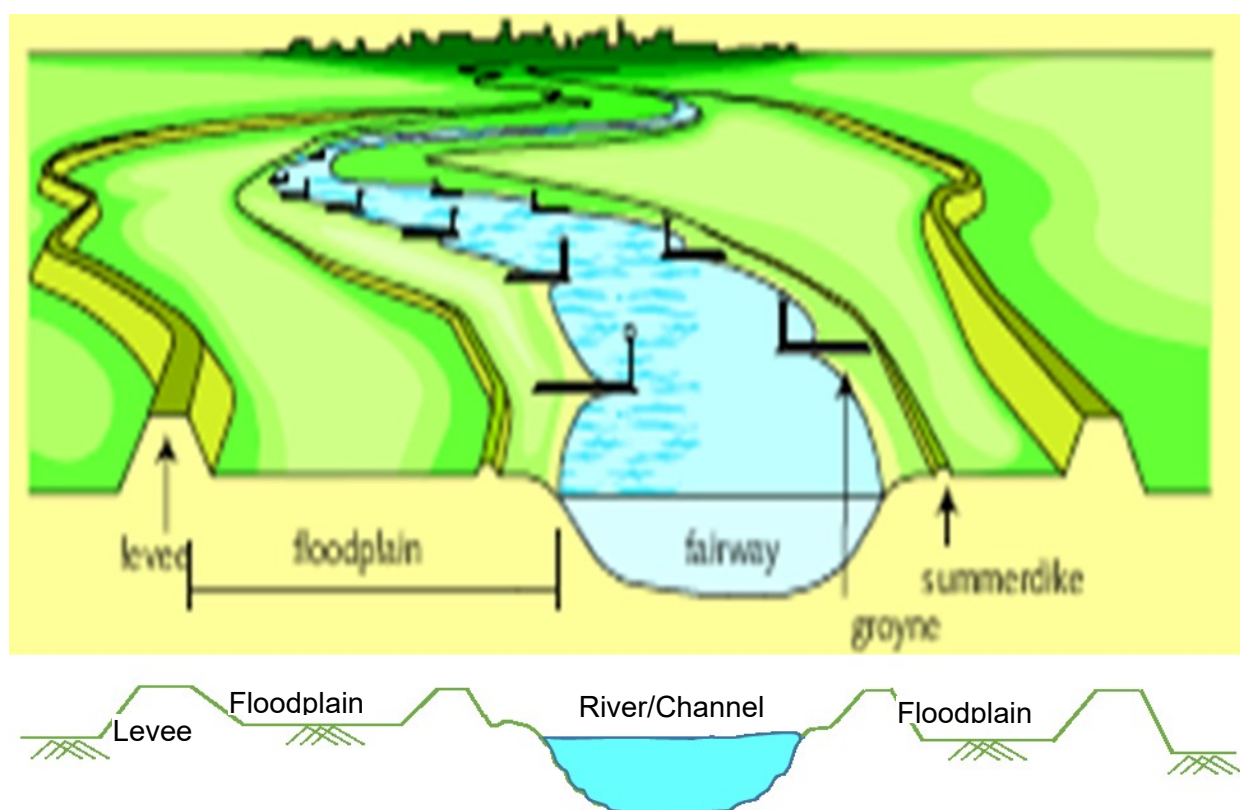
Plan and cross section of flood protection arrangements (Typical)
